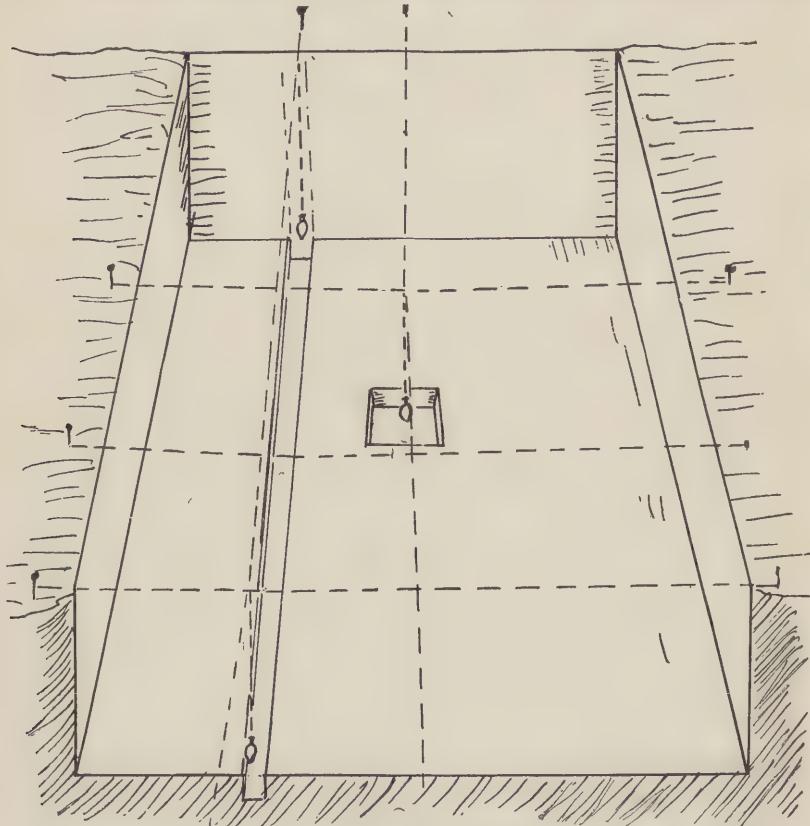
SECTION THROUGH EXCAVATION SHOWING USE OF LINES.
